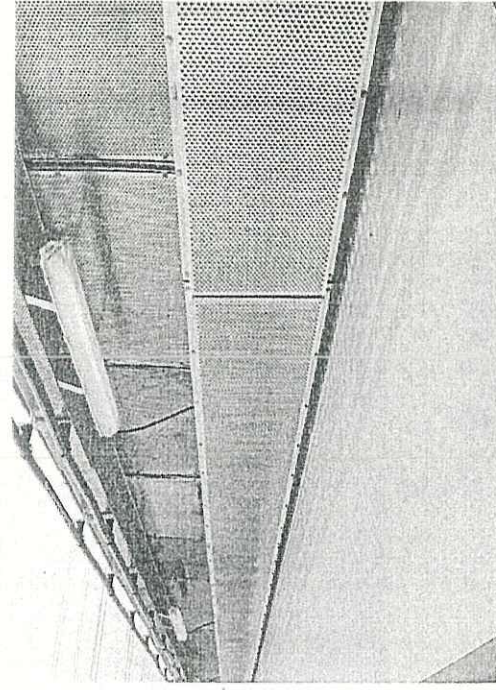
Acoustic Panels at CH35+218 was Repaired
